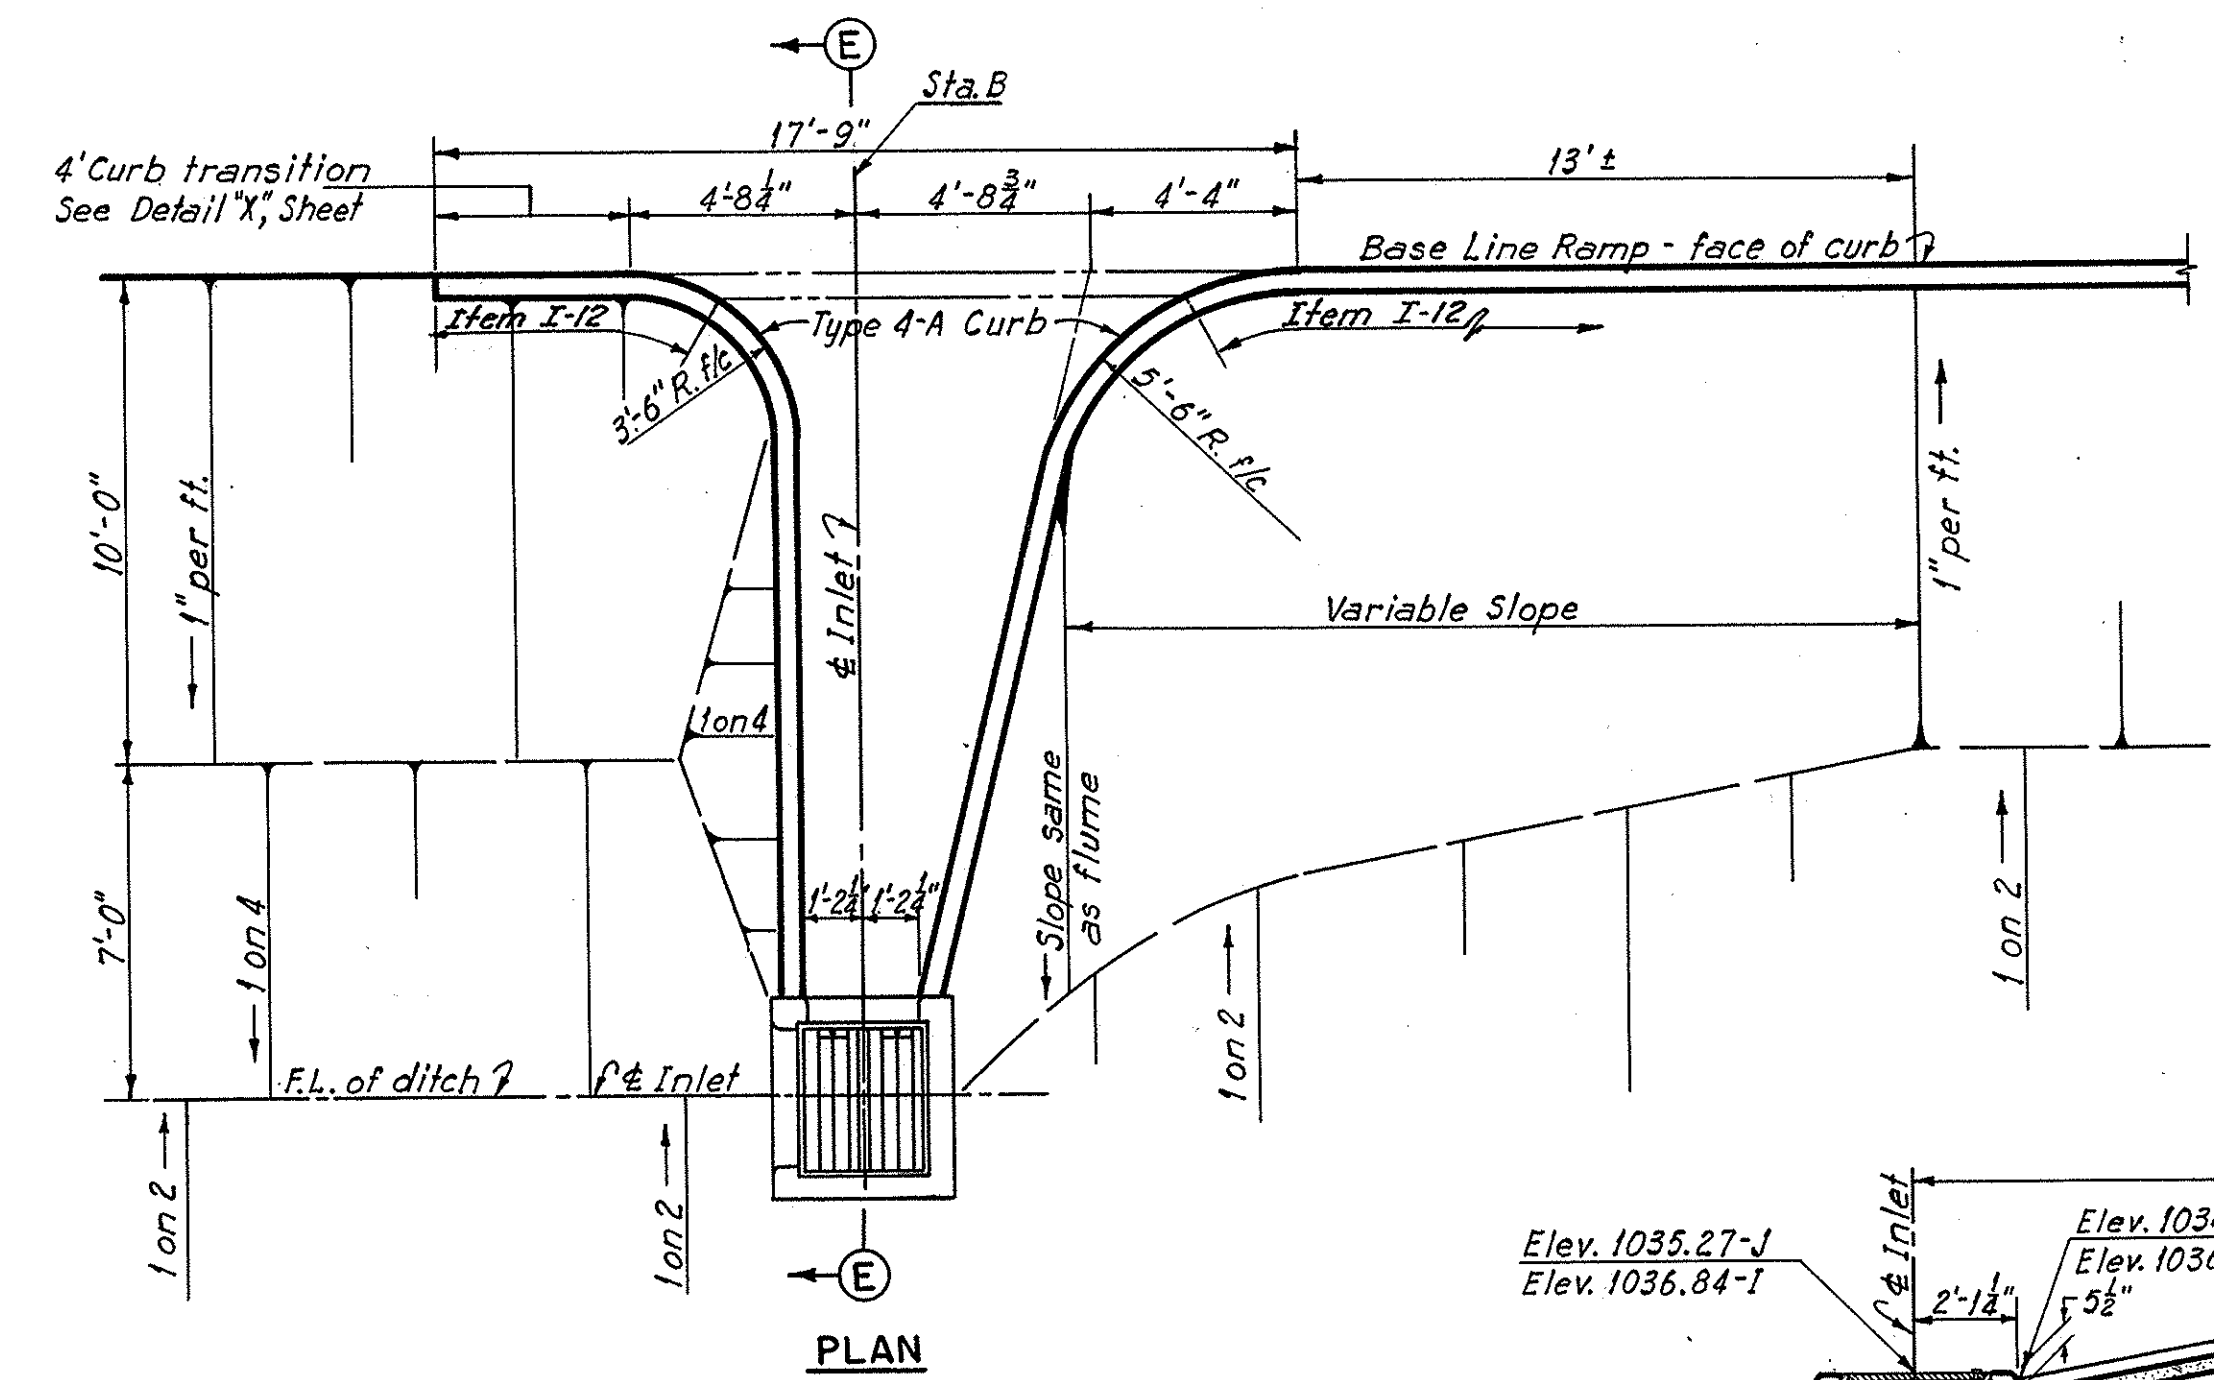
DETAILS OF CONCRETE APRON FOR MEDIAN INLET
